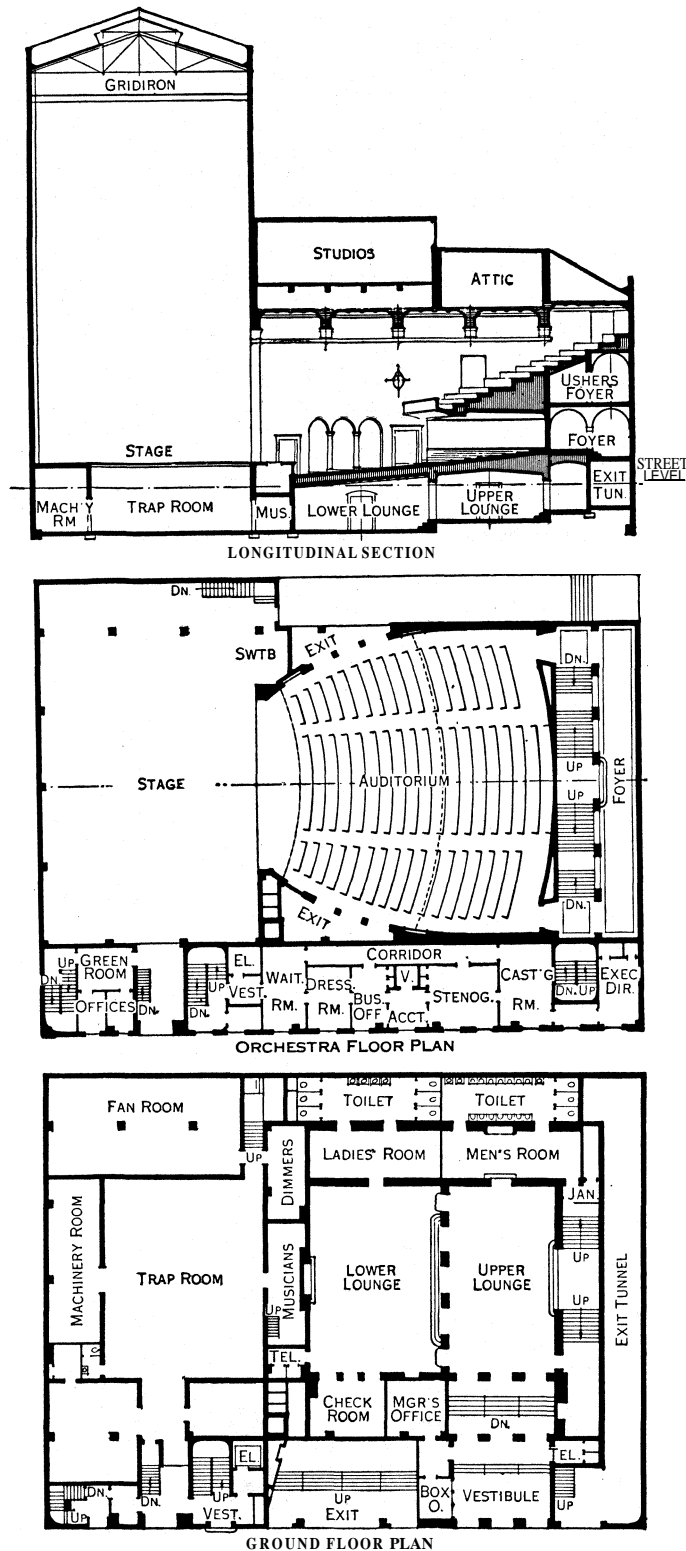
PLAN OF GUILD THEATRE, NEW YORK CITY. DESIGNED BY C. HOWARD CRANE. FRANZHEIM AND BETTIS, ARCHITECTS
